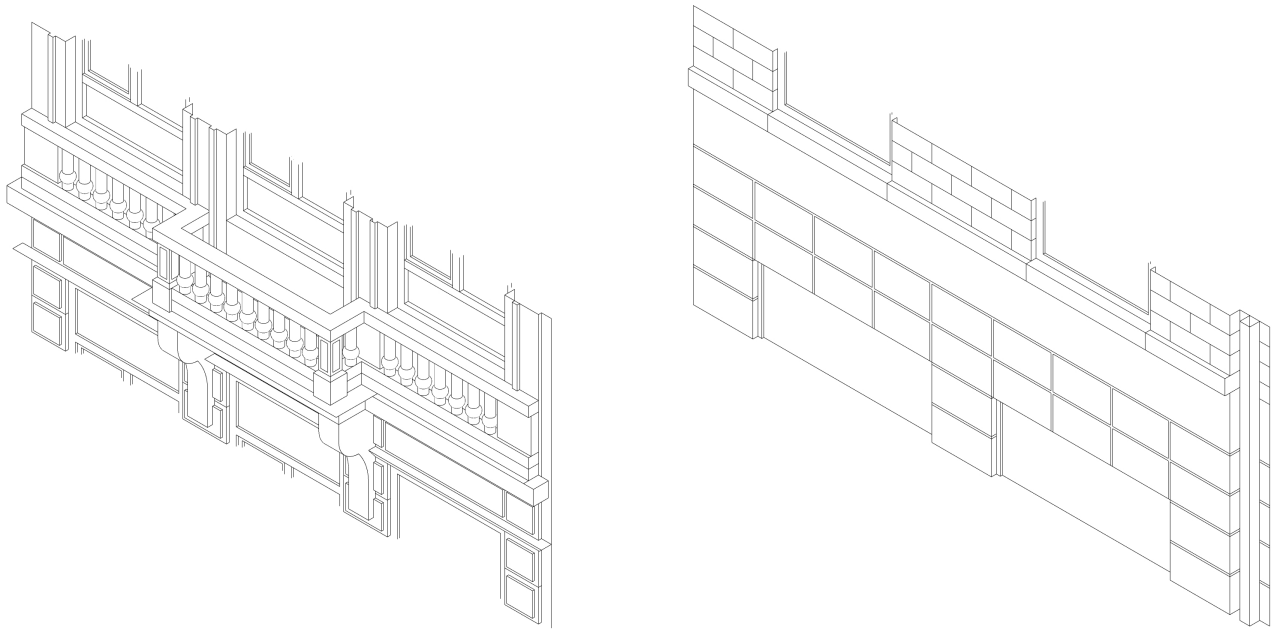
, a section of the facades of the existing houses (left) and new building (right) of Pension van Schoonhoven (own work)
